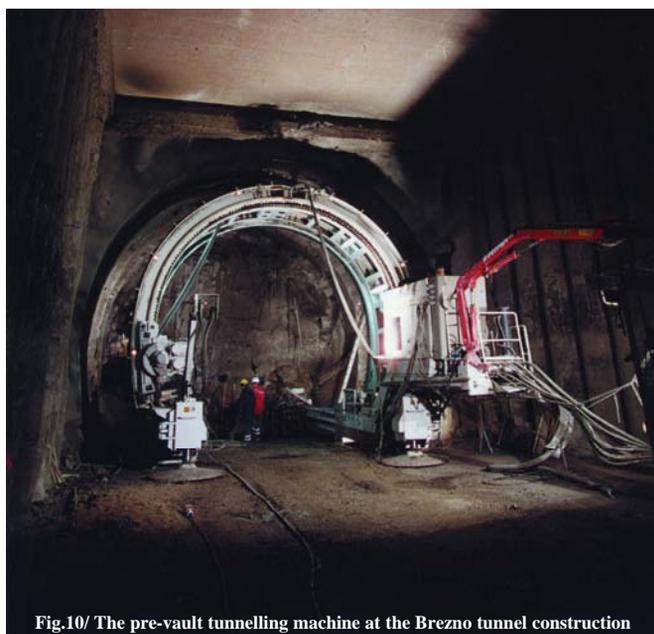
/ The pre-vault tunnelling machine at the Brezno tunnel construction
